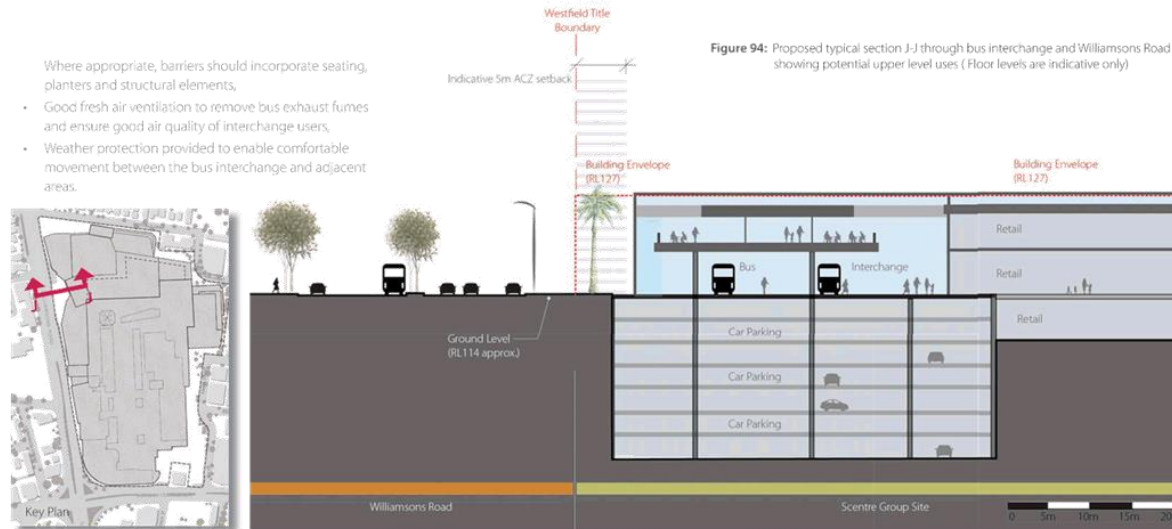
Proposed typical section J-J through bus interchange and Williamsons Road showing potential upper level uses (Floor levels are indicative only)
